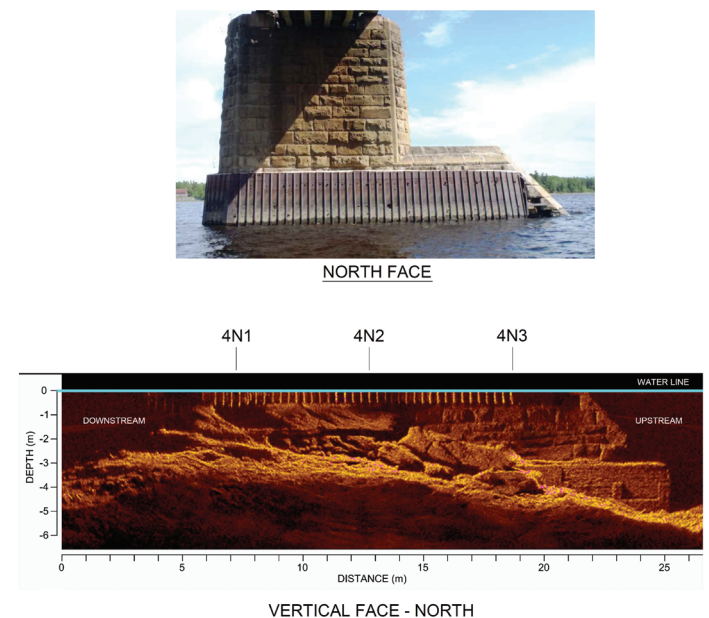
High resolution scanning sonar imagery of Pier 4 (Amec Foster Wheeler 2015). Note caisson, remnants of previous concrete encasement, stone masonry, and steel sheeting.
